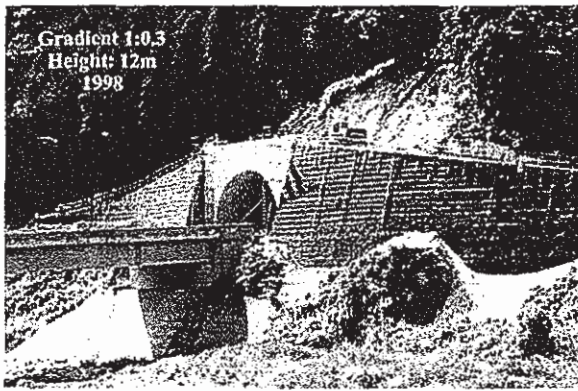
The Geosynthetic reinforced steep slope embankment currently used around tunnel
